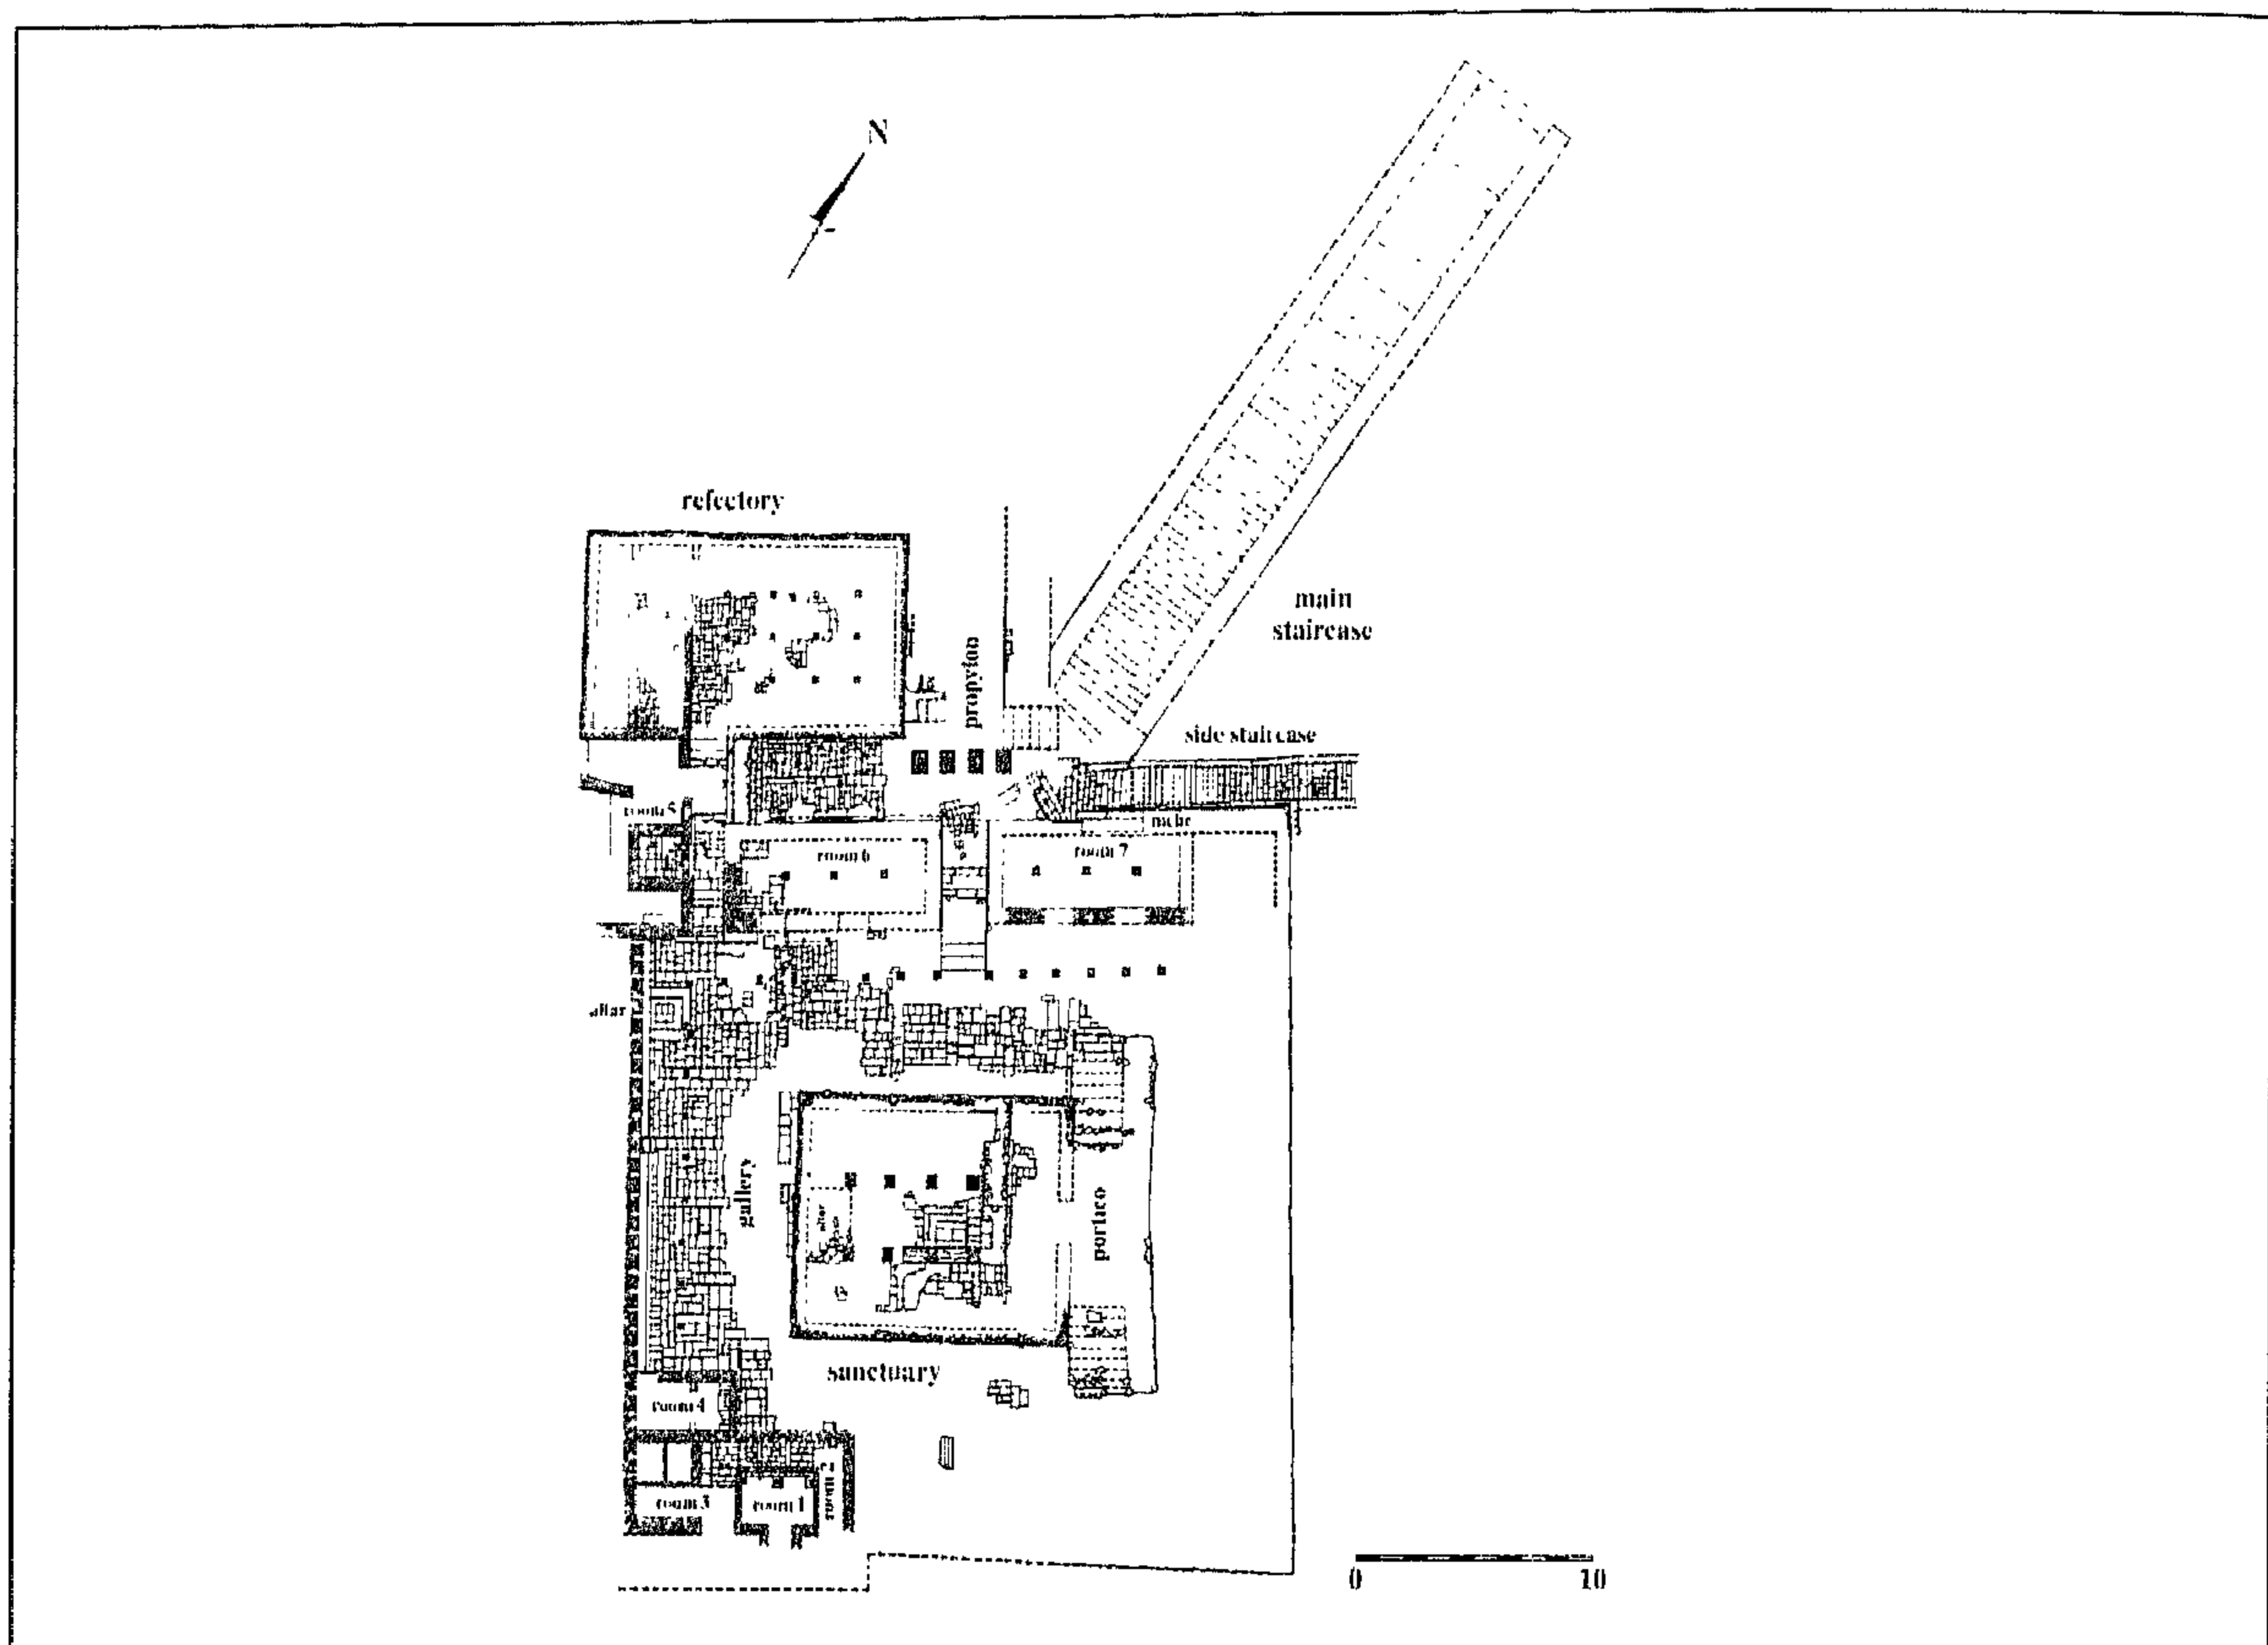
Mayfa'an temple, plan of excavated buildings.
